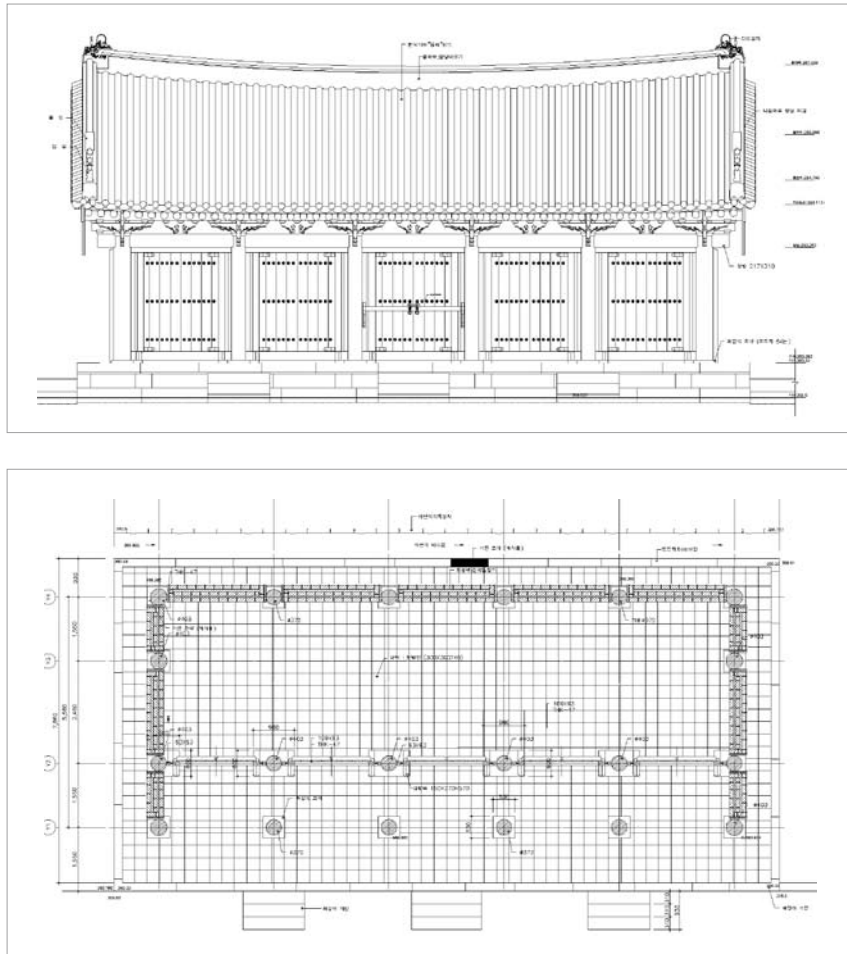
Drawing of Elevation and Plan for Main Shrine Building Reconstruction
